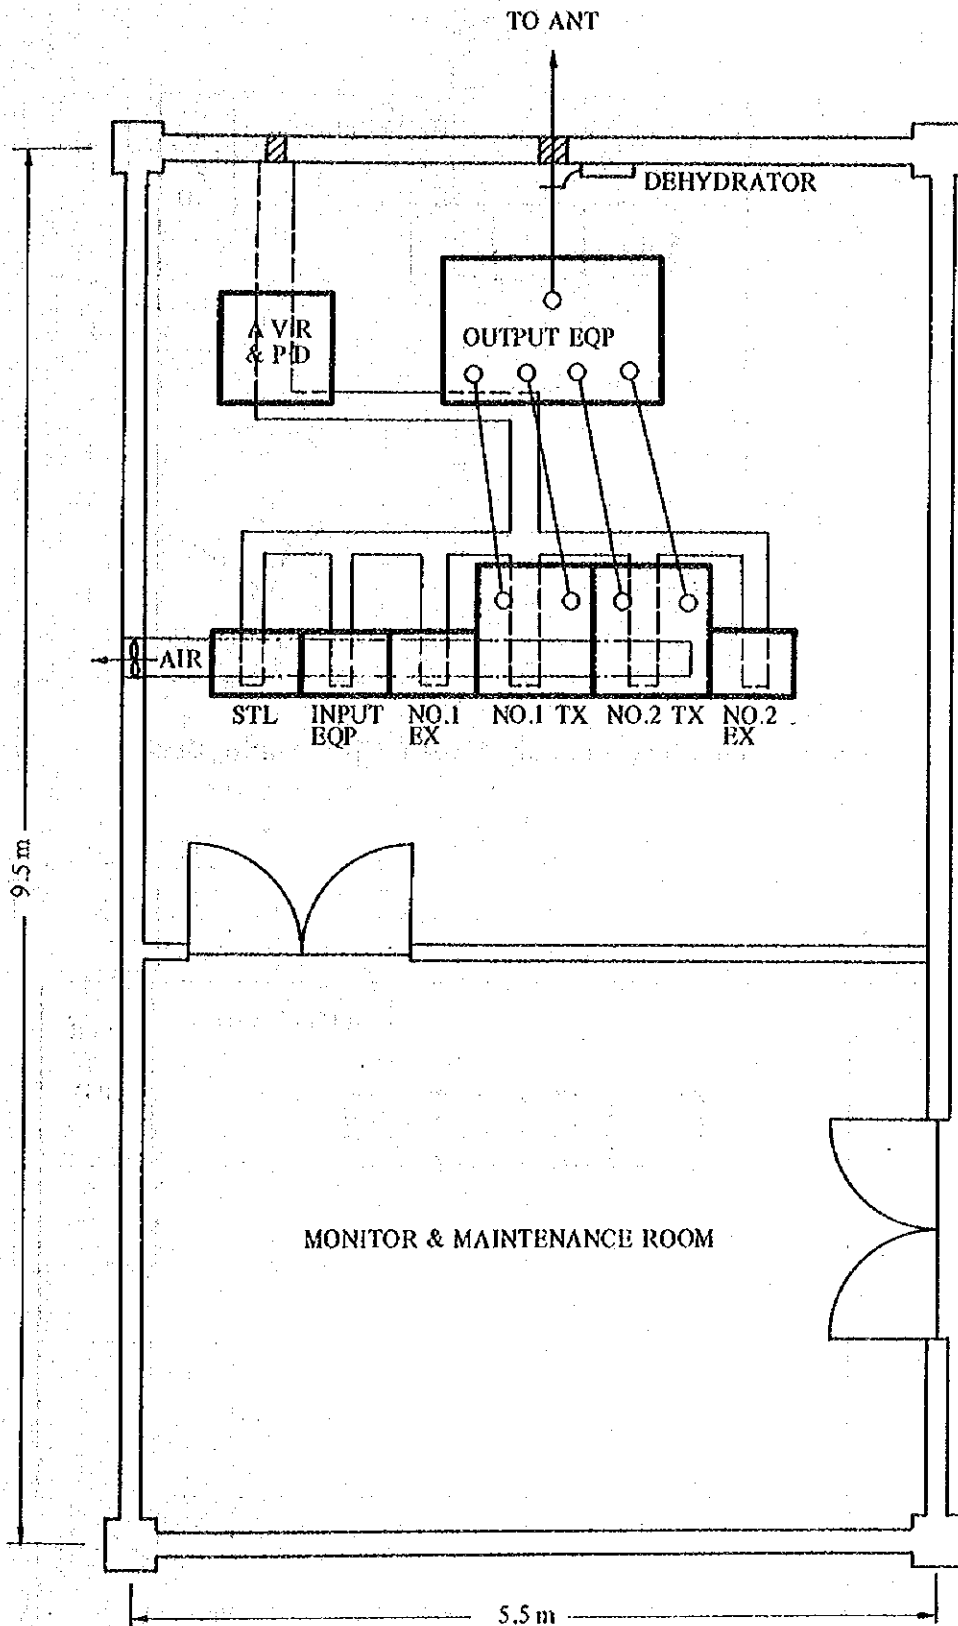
Floor Layout of VHF 1~2kW TV Transmitting Station
